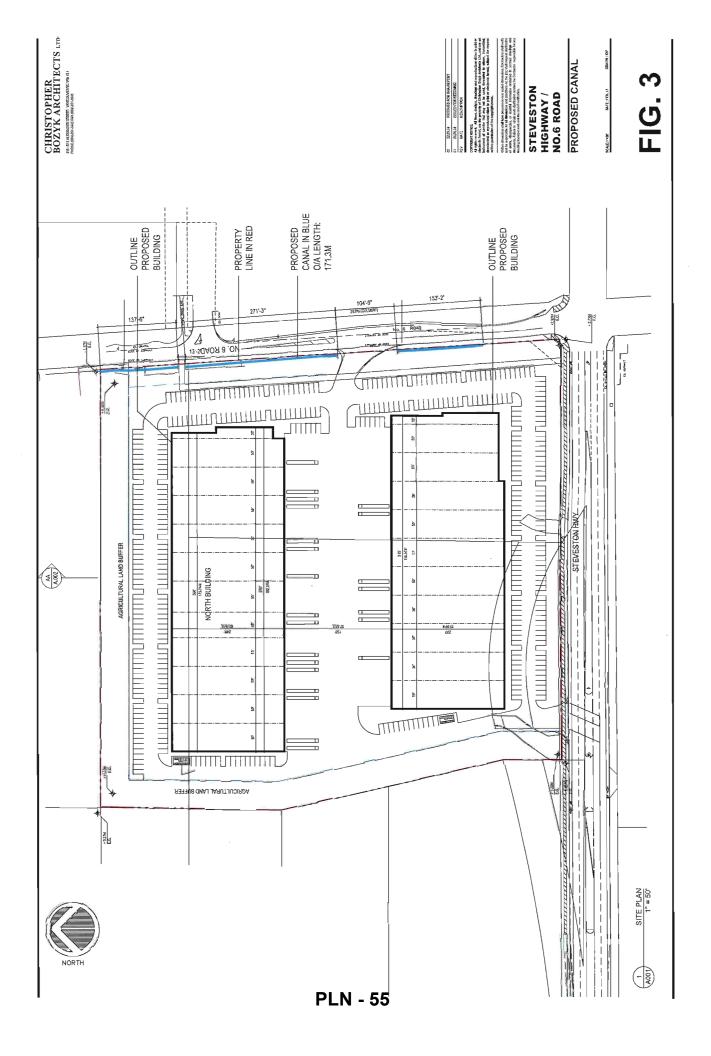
Steveston Highway / No. 6 Road Proposed Canal
